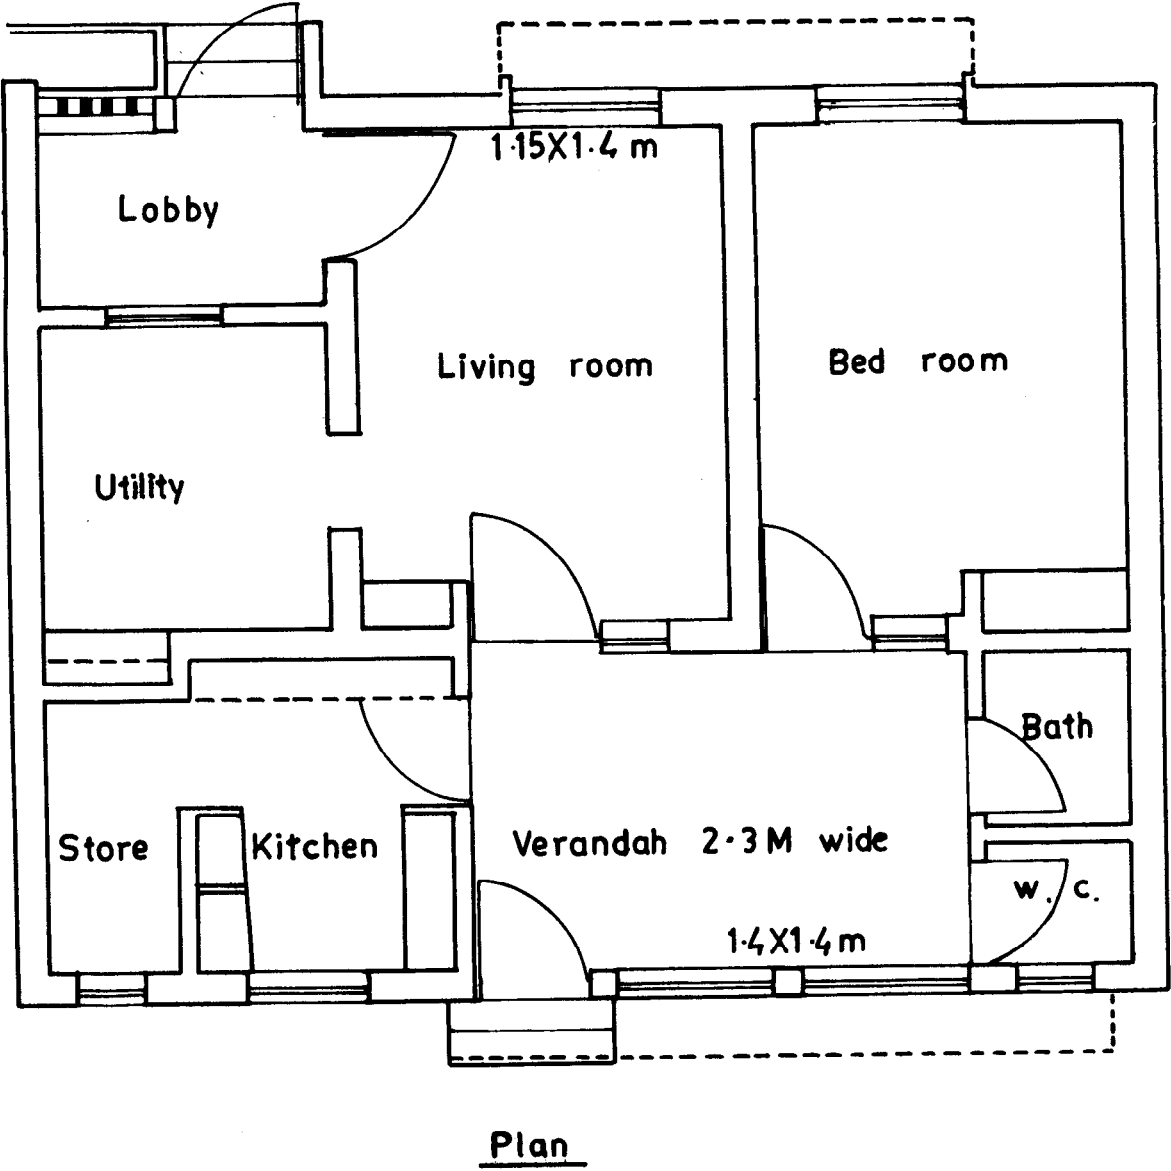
PLAN OF A TYPICAL TWO ROOM HOUSE
